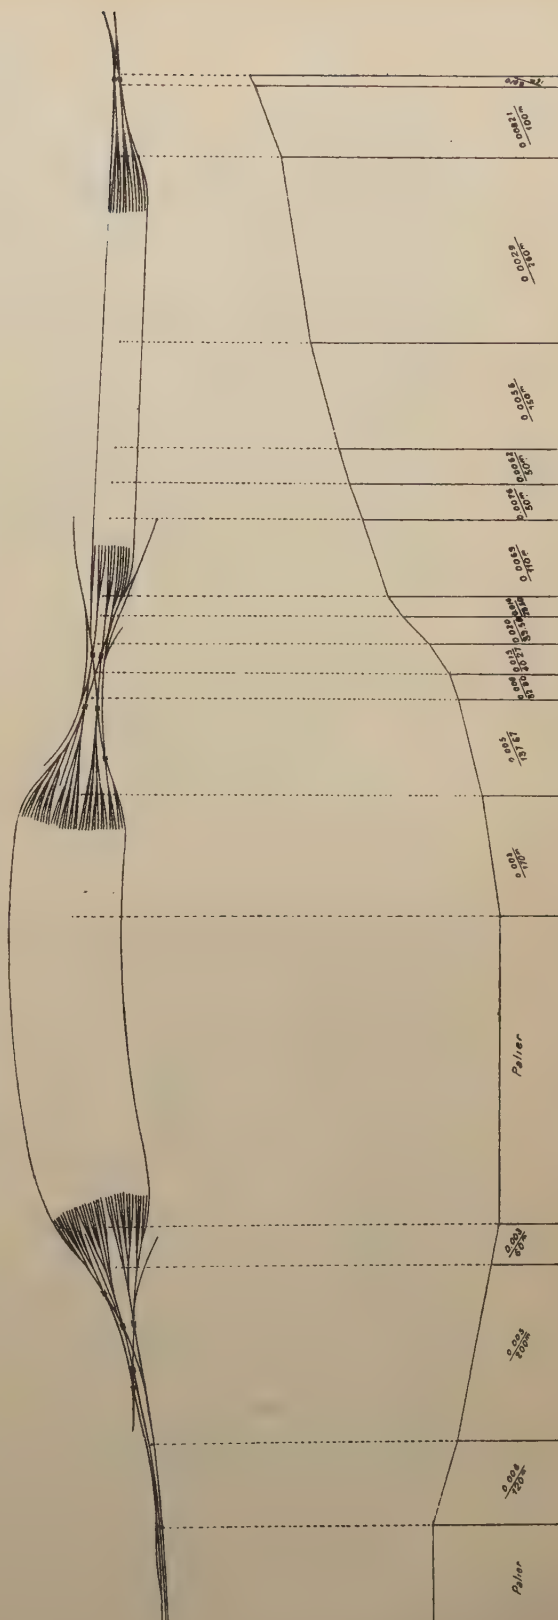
Lille-Délivrance Station. — Shunting by gravity. Plan and profile.
